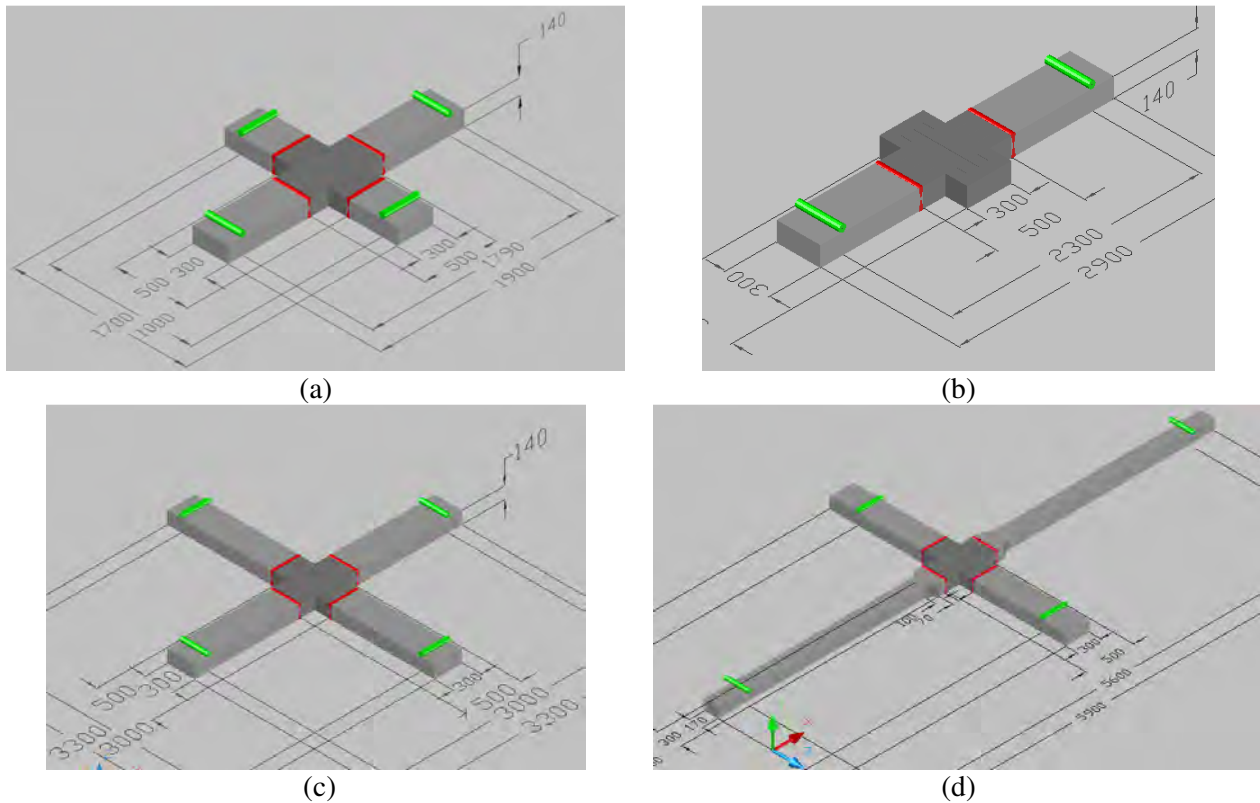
Cruciform specimens: (a) CR21NOC; (b) CR10; (c) CR11; (d) CR21.
